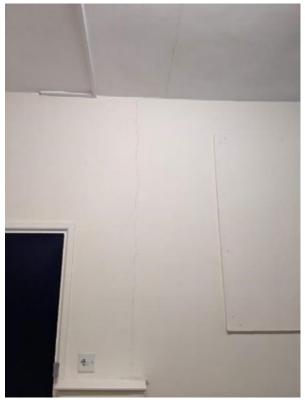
Crack in wall and ceiling in GF Office 1
